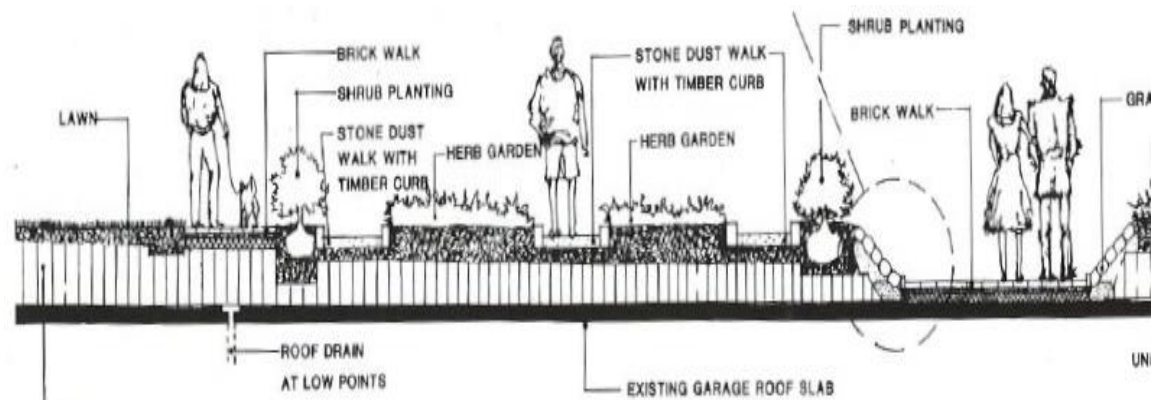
Section of intensive roof top garden. (Laterza, 1975, p.28)
